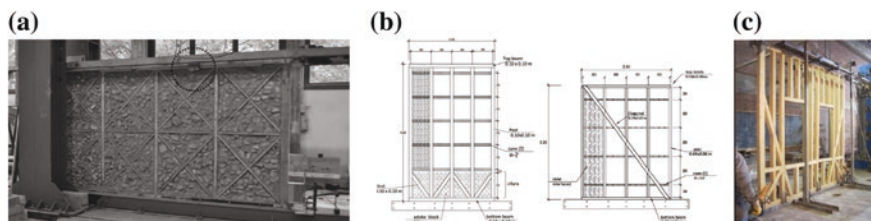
Timber frame walls: a system used in the reconstruction of Haiti [25], b *quincha* walls [26], c timber frames characteristic of himis construction, Turkey [27]
